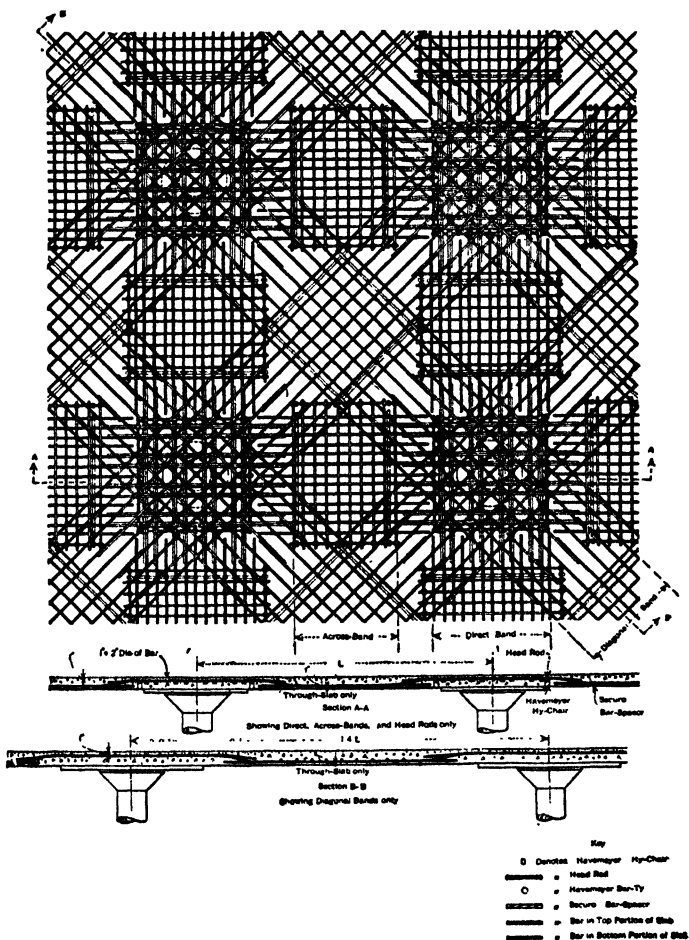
Four-way Flat Slab Construction. Typical Interior Panel
